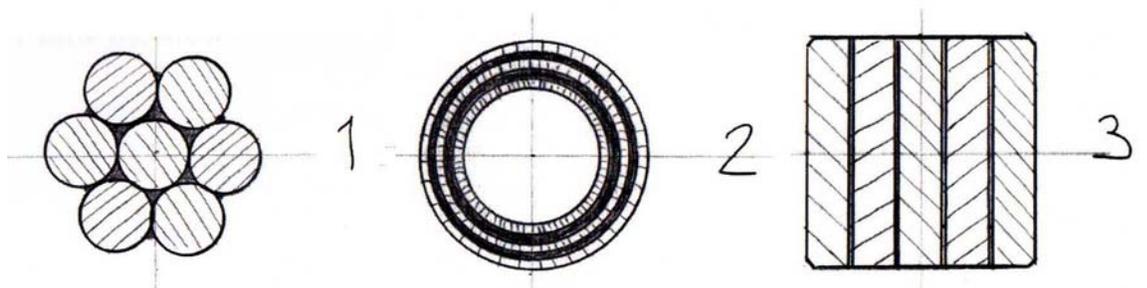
Laminated Glass Column Configurations (Nijssse 69)
